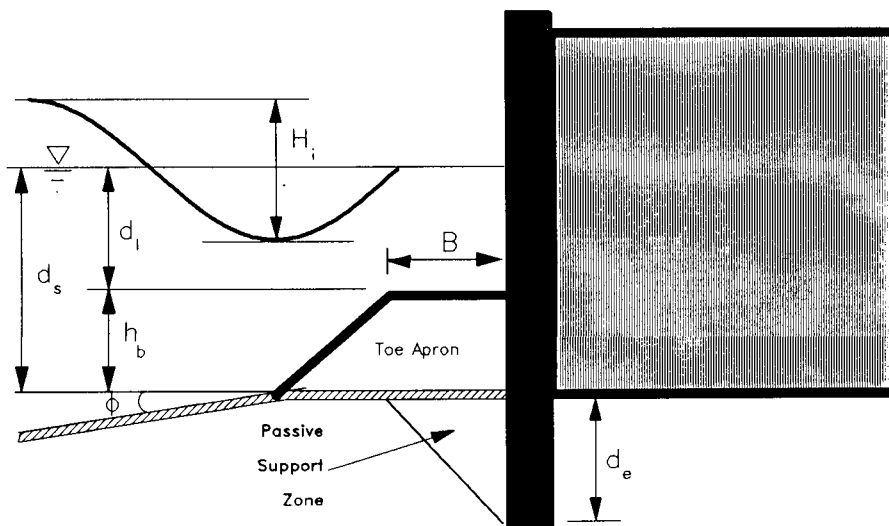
Typical Toe Apron for Sheet-Pile Walls
